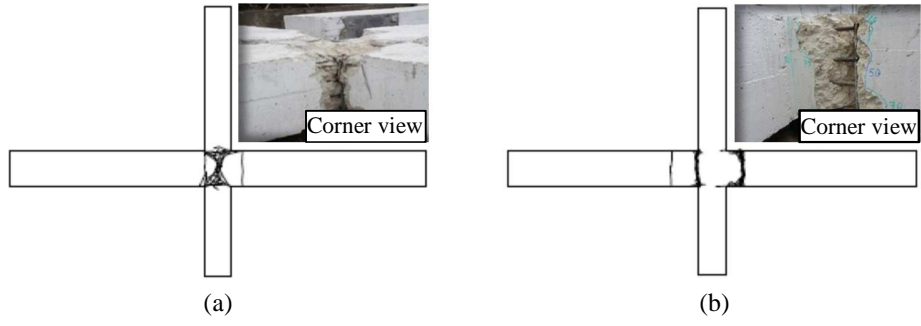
The extent of damages before retrofitting a) JPA3 and b) JPB.
